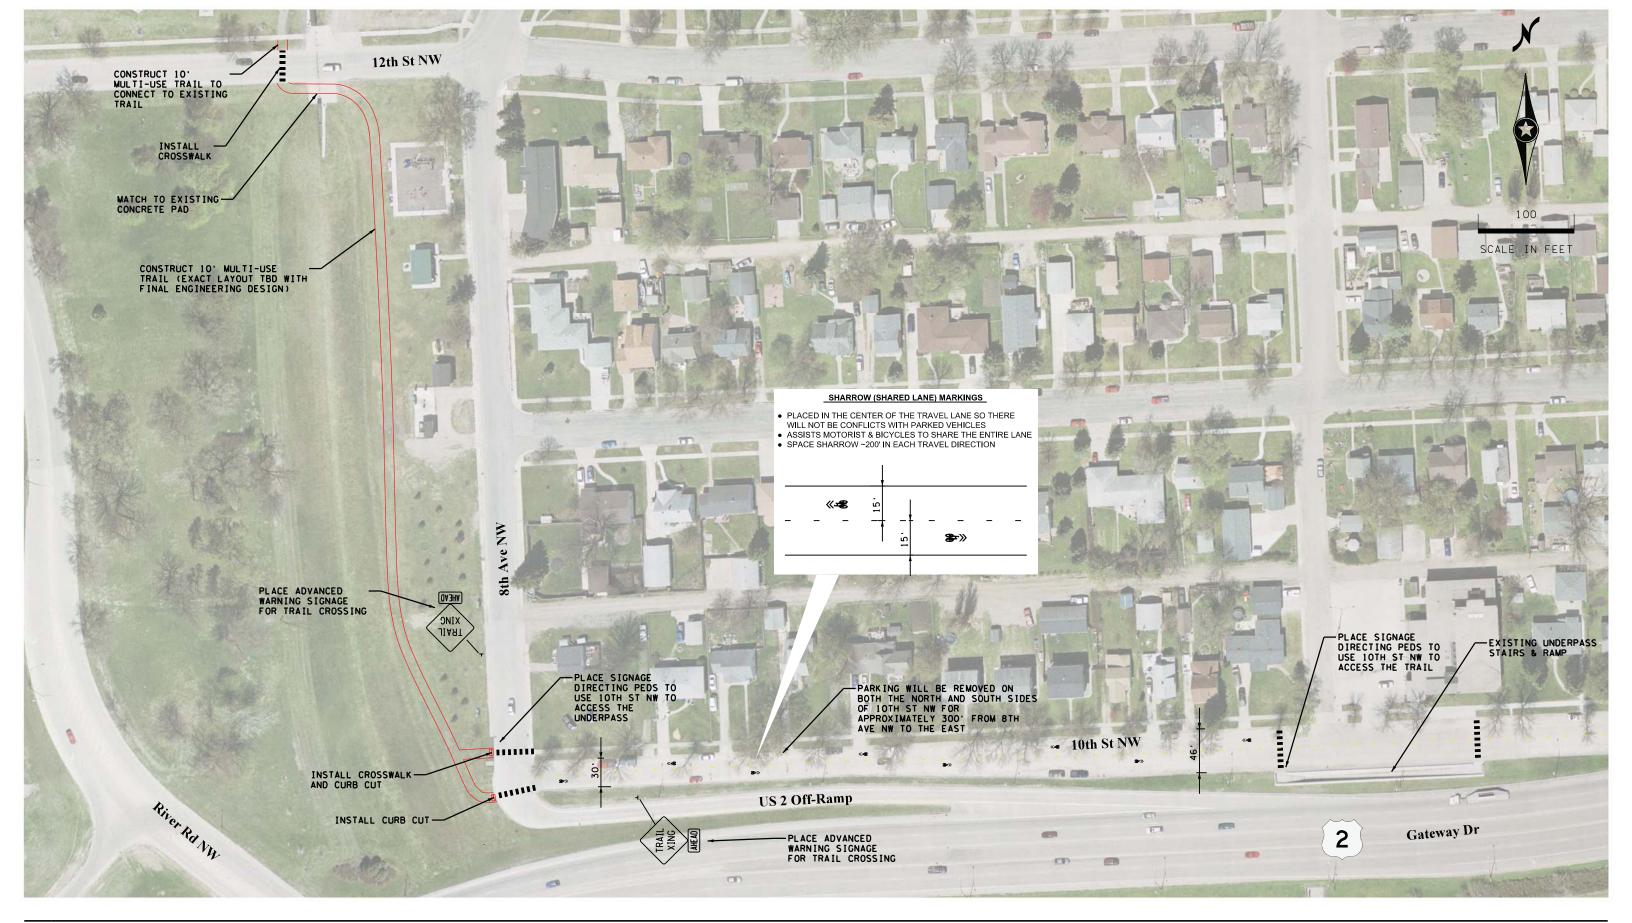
MULTI-USE TRAIL CONNECTION-ALTERNATIVE 3 WITH PAVEMENT MARKINGS ON 10th ST (TRANSPORTATION ENHANCEMENT PROJECT)
